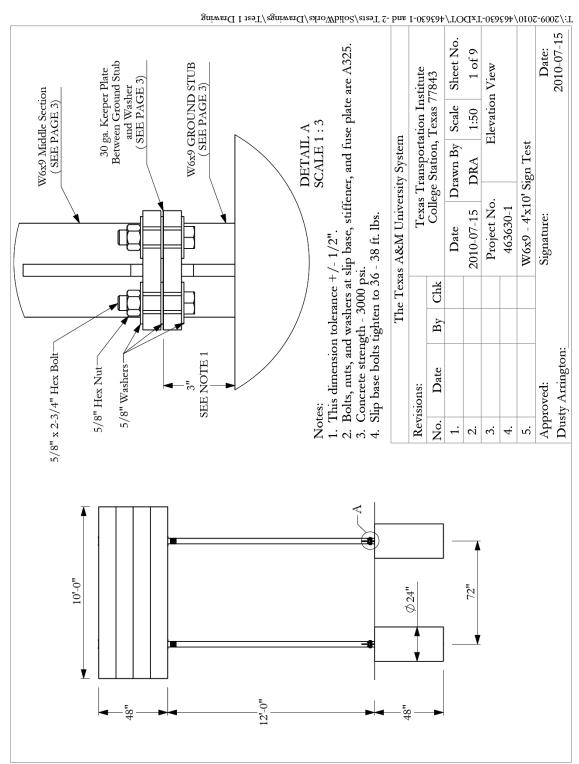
Details of the TxDOT W6×9 – 4-ft \times 10-ft Large Sign Support Test Installation.
